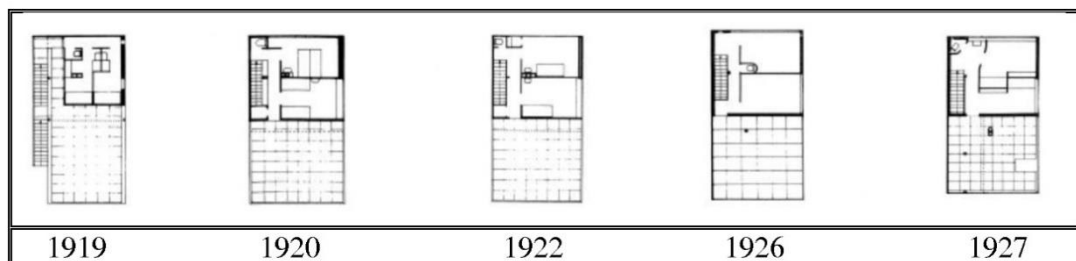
Variety of the plans in Citrohan Houses (Risselada, 1991).
